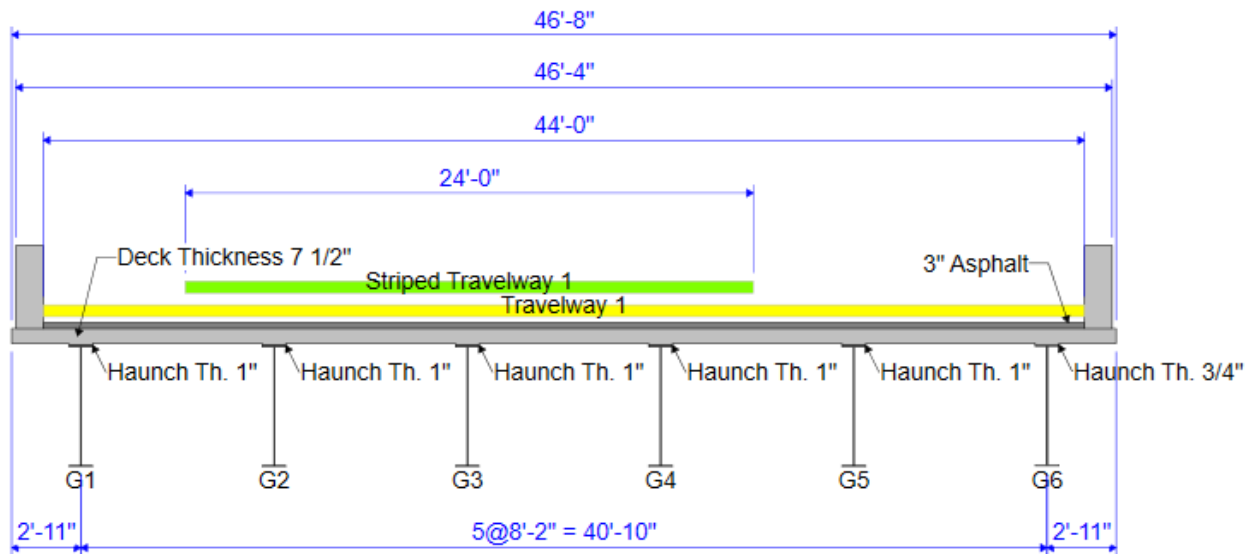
Bridge Cross Section for S080 00526 (AASHTOWare™ BrR, 2023)
